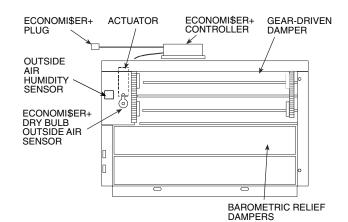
EconoMi\$er+ Component Locations — 7¹/₂ to 12¹/₂ Ton Units
